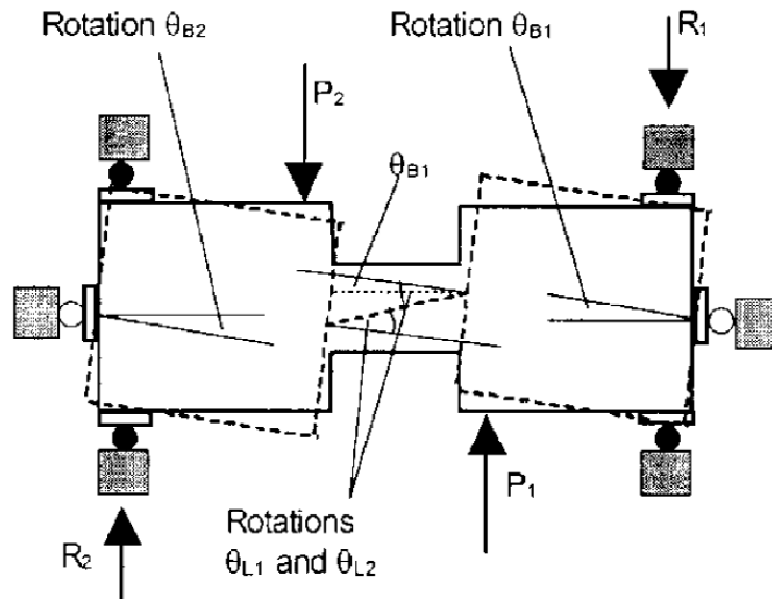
Loading Setup for Specimen P02 (Galano and Vignoli 2000)
